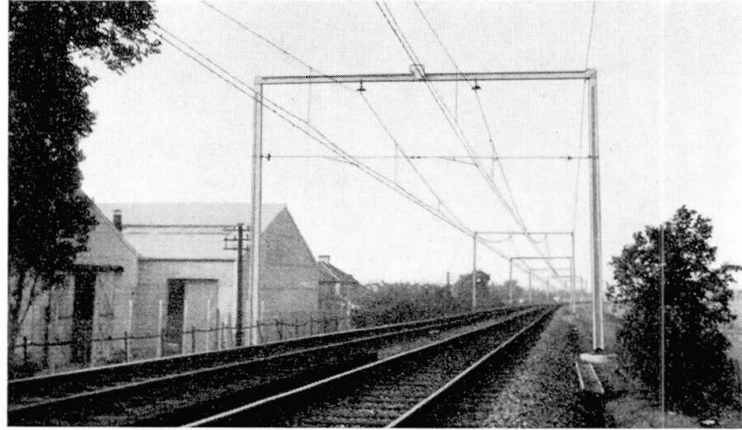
Prestressed Concrete Portal Mast near Southend (England).
